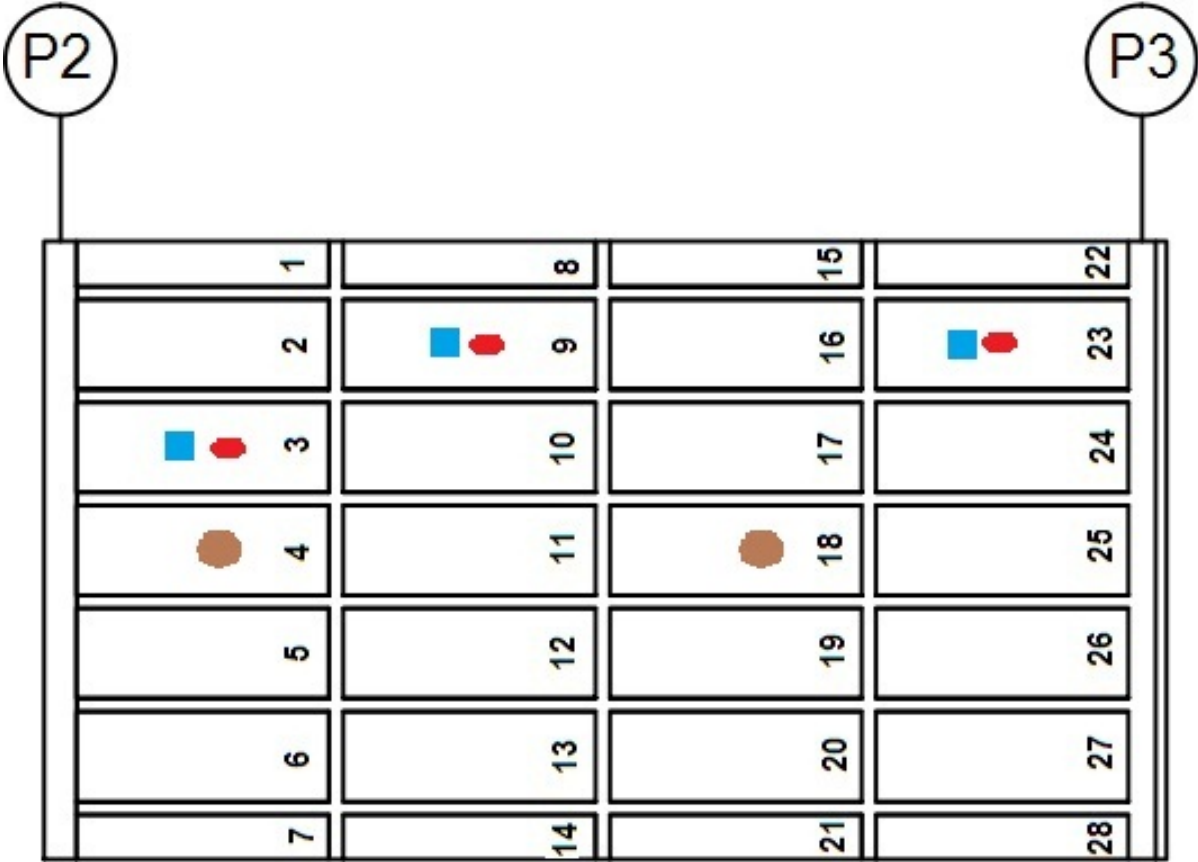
Test conducted at various locations between Pier P2 and Pier P3
